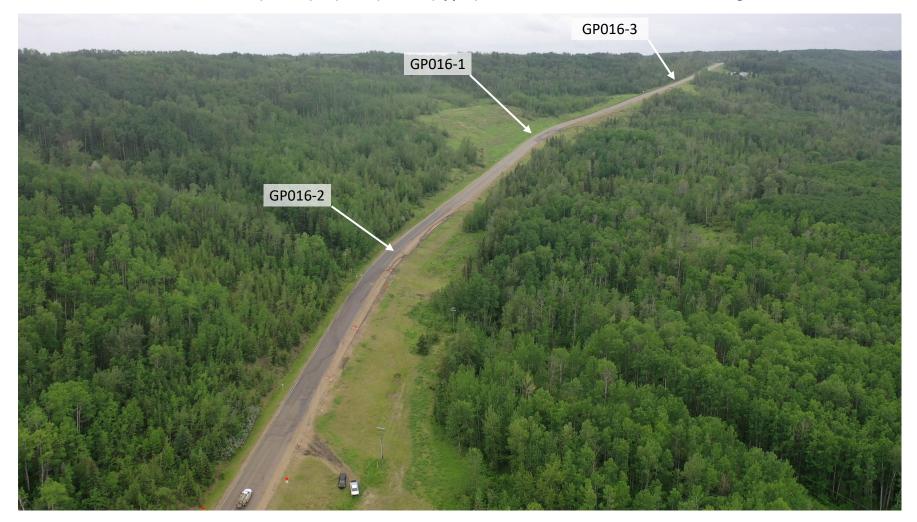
Overview of GP016-2 (lower) site. Note pavement patches, and cracking and settlement along both lanes of Hwy 666:02. Photo taken June 13, 2023, facing southeast.
